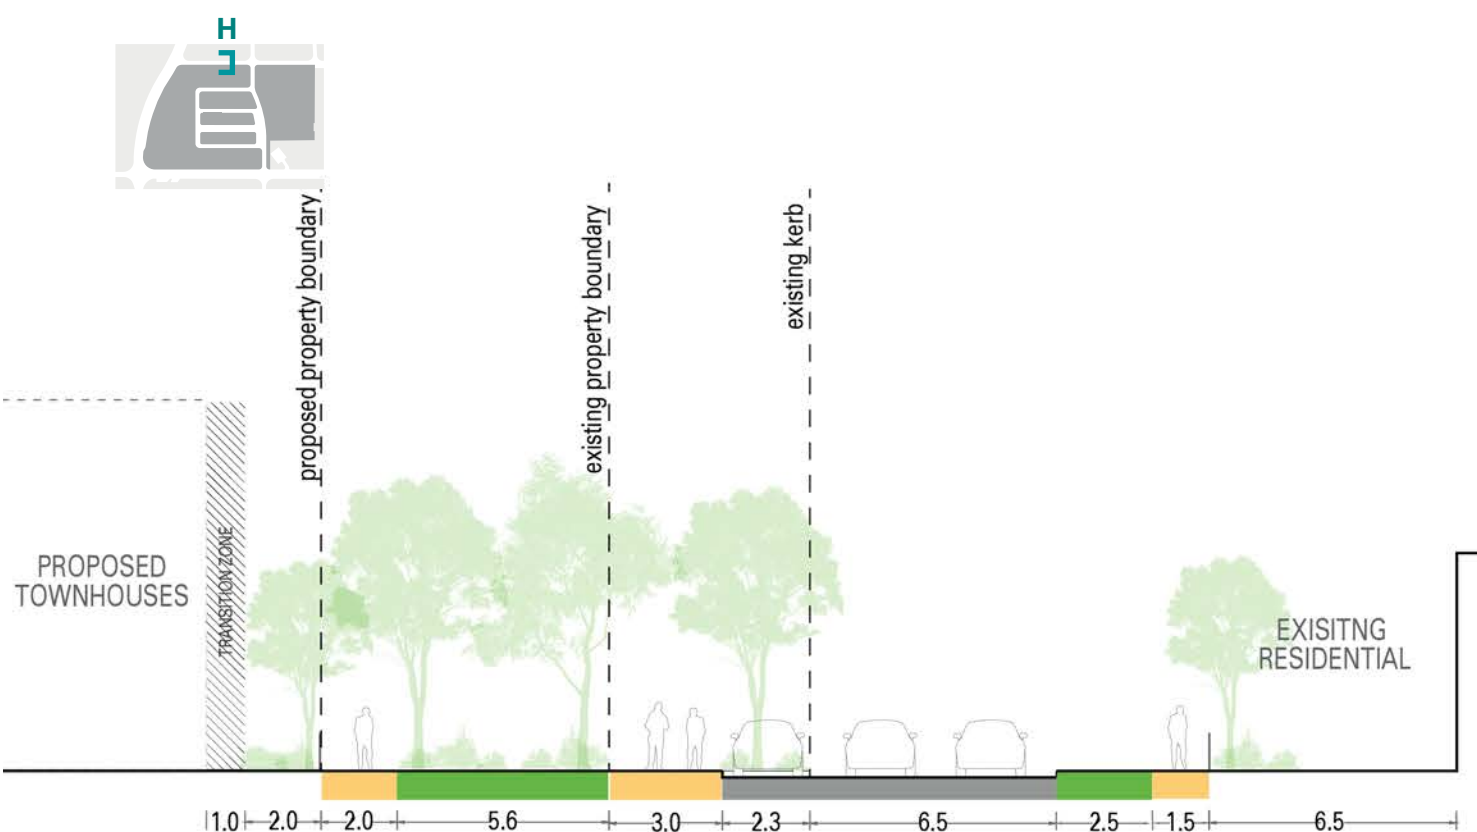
Section H: Perkins Avenue (1:200@A3)
